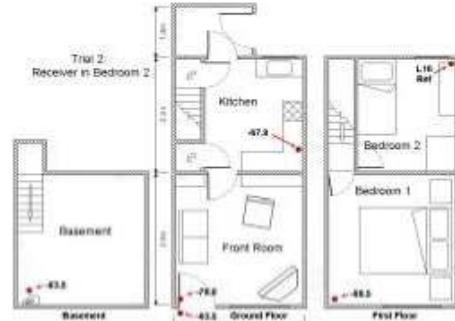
Trial 2 'Receiver in the Bedroom' – Results on floor plan
